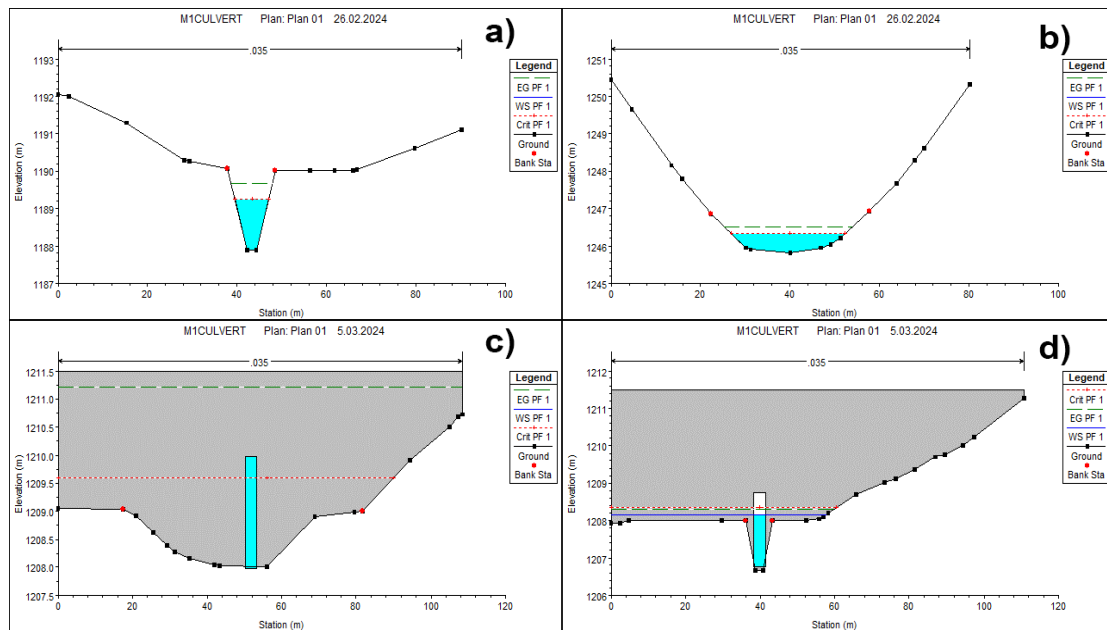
Channel cross-section and water level at the downstream (a), upstream (b) of the channel and culvert inlet (c) and outlet (d) for Q100 discharge
